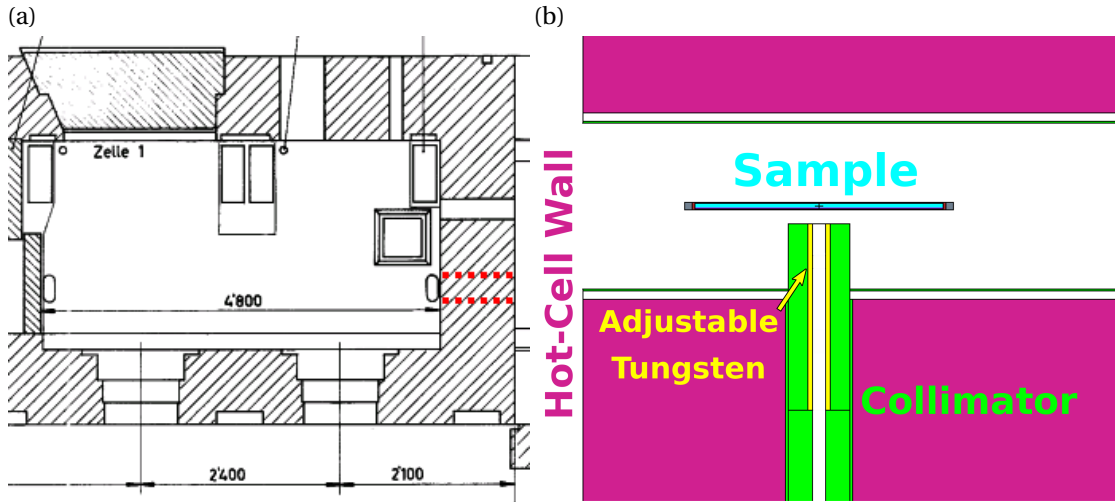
(a) A top view technical drawing of the hot-cell number 1 of the PSI Hot Laboratory, length units in mm. The red dashed lines mark the position of the fuel rod channel. On the right side of this channel a hot cell extension is mounted (not shown). (b) A to-scale illustration of the setup in the fuel rod channel. The collimator (green) is mounted in a hole in the concrete walls (violet) of the fuel rod channel. The adjustable tungsten blocks (yellow) at the tip of the collimator are shown in their fully opened configuration (~18 mm apart). The sample under investigation (blue) can be moved past the collimator (shown is a 40 cm fuel segment but up to full-length spent fuel rods are possible).
